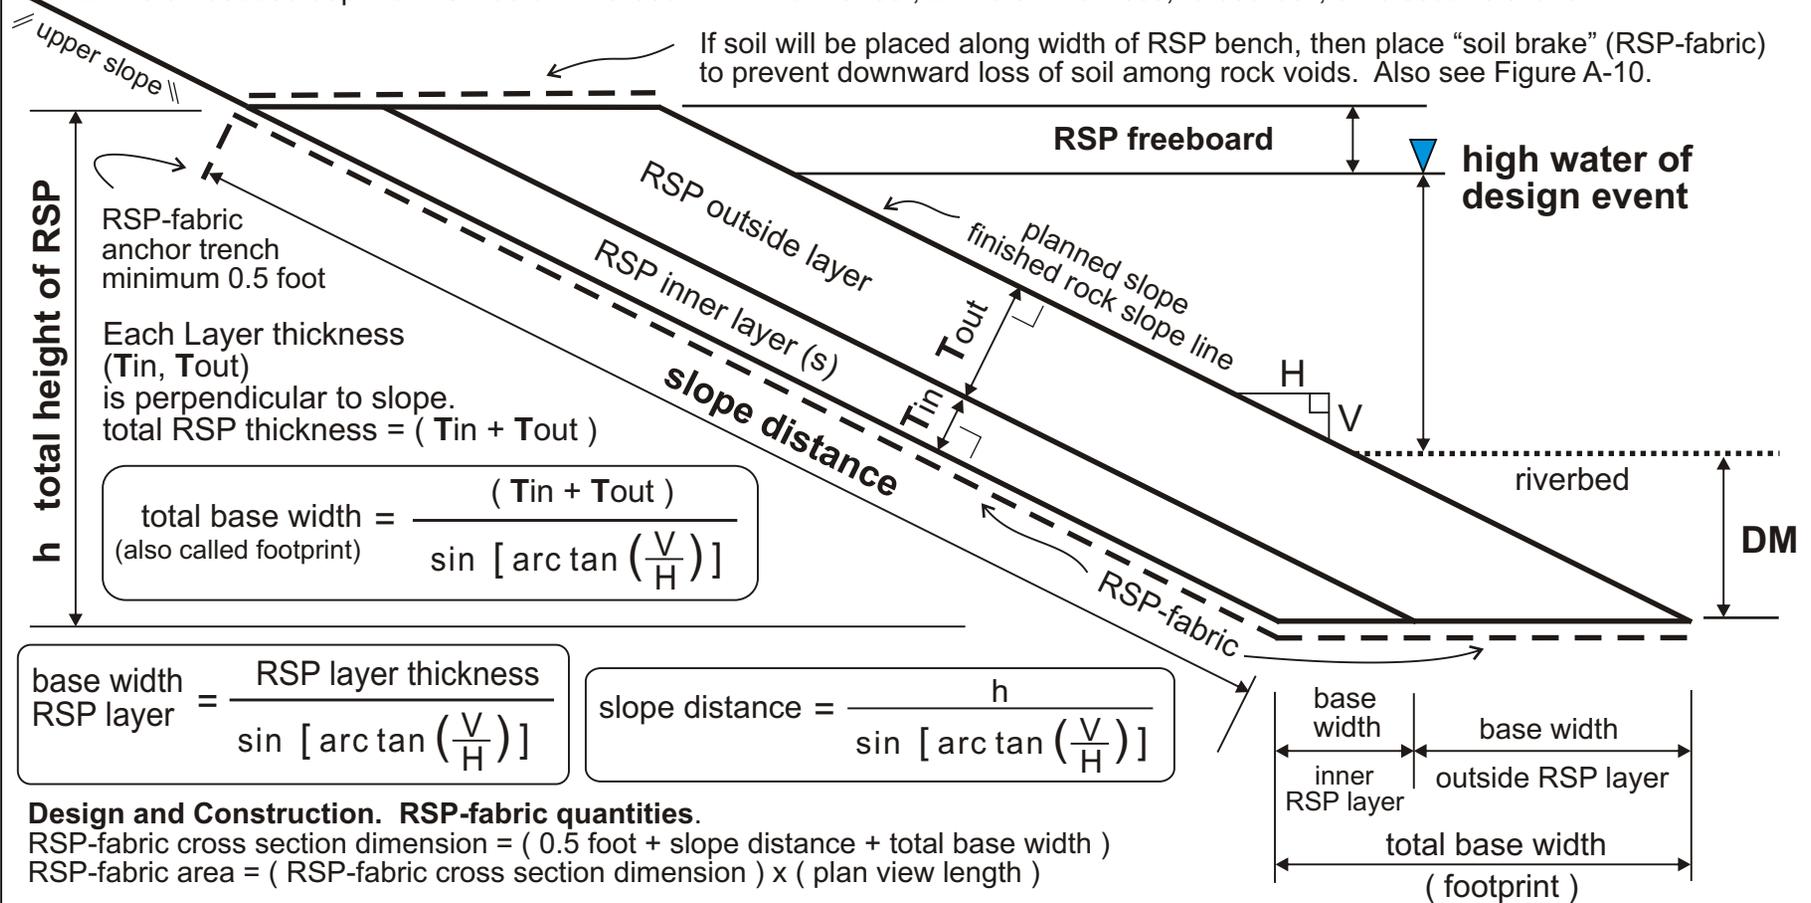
CA Layered RSP with EMBEDDED Toe Cross-section No Scale US units Not a Standard Plan
